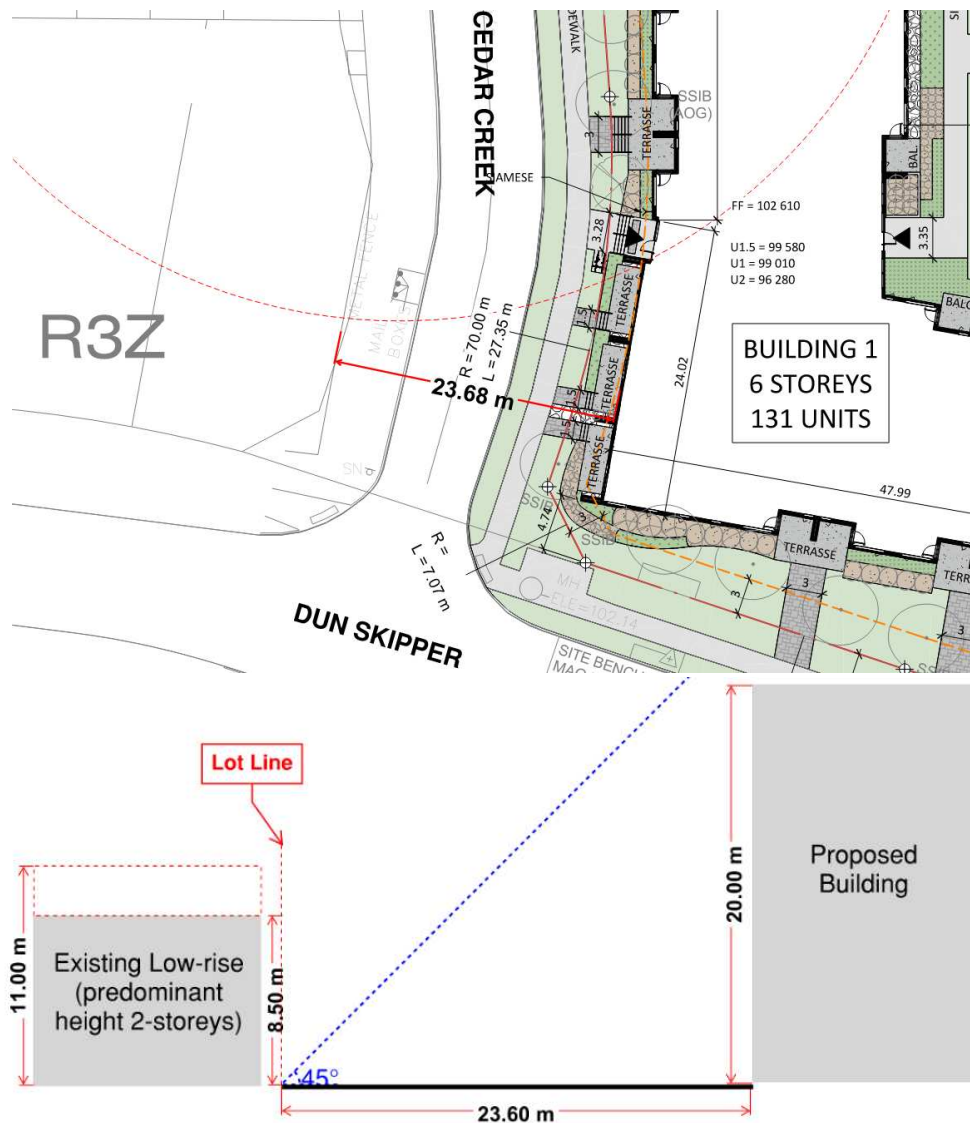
Site Plan Excerpt (Building 1) and Angular Plane detail (West)
